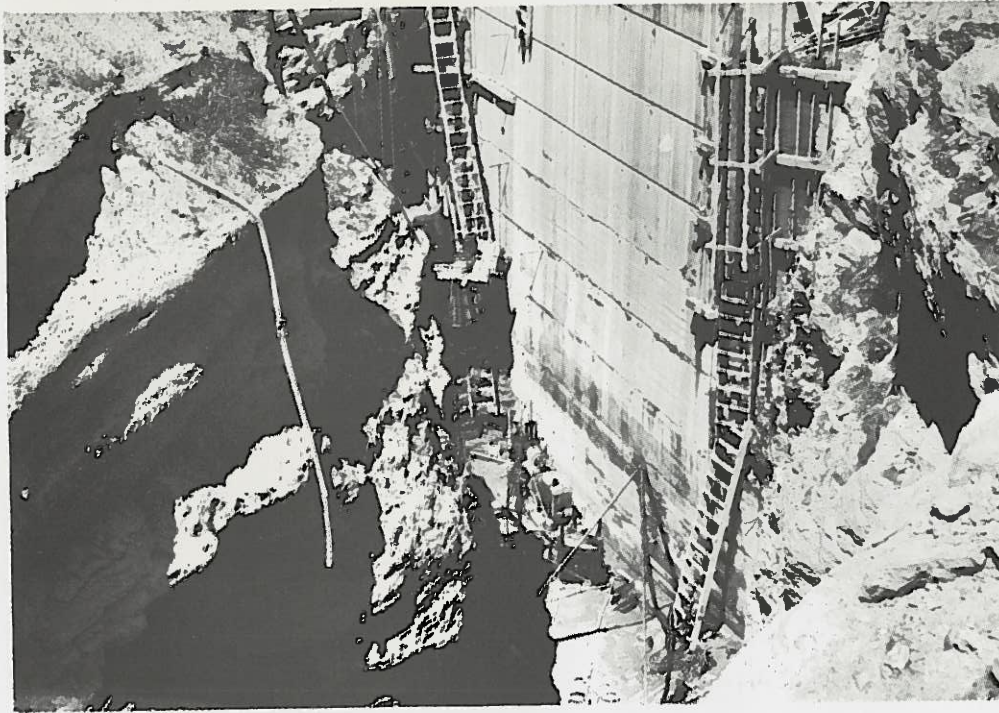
CUTOFF TRENCH AT TIE-IN TO CONCRETE STRUCTURE.
